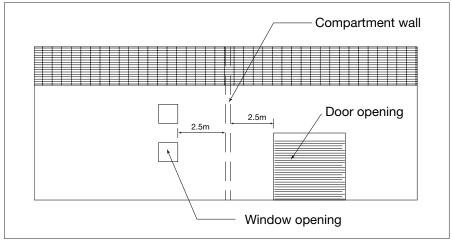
Openings in external walls - minimum distances from compartment walls
